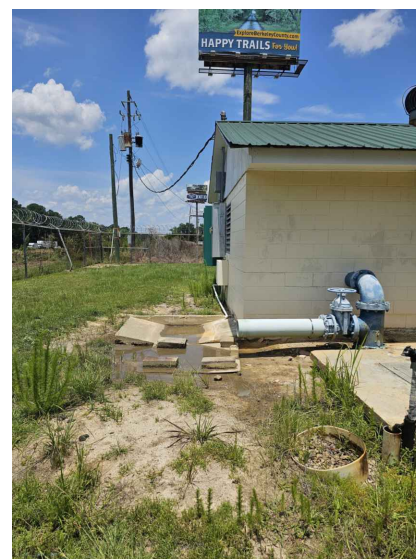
LOOKING NORTH TOWARD SPILLWAY CONCRETE AND DISCHARGE PIPE
